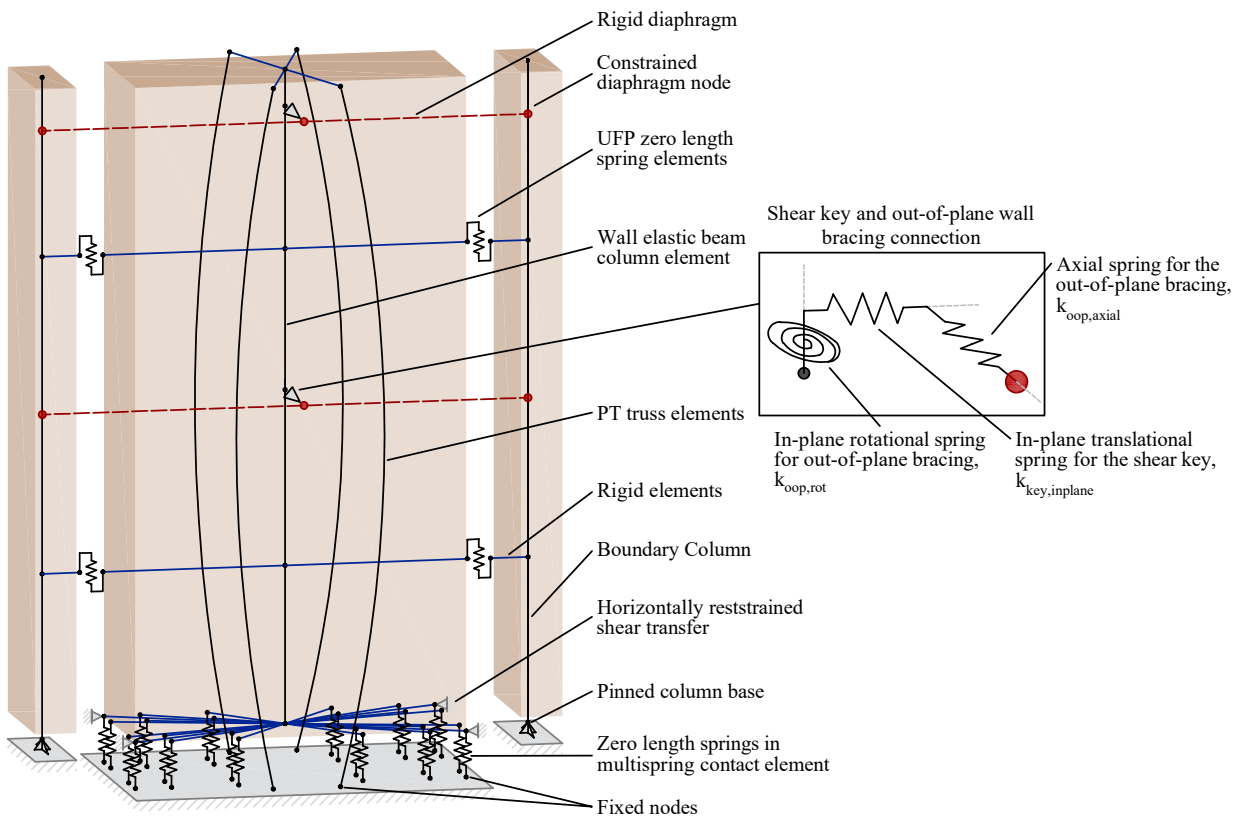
Post-tensioned rocking wall numerical model schematic for the 10-story building specimen
